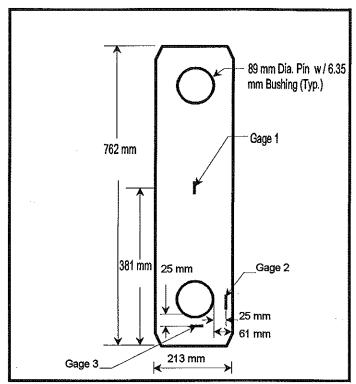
Span 2, Pier 1, Beam C. Fixed End Link Plate with Strain Gages.
